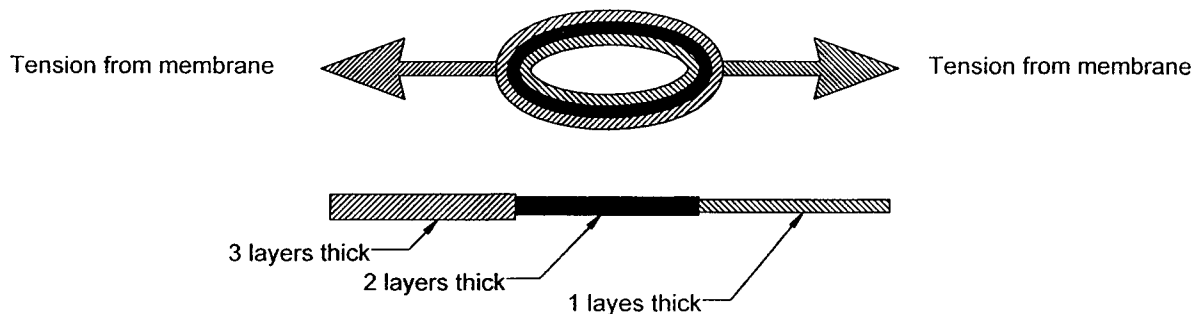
Cross-Section and Elevation View of a Flexible Mast
